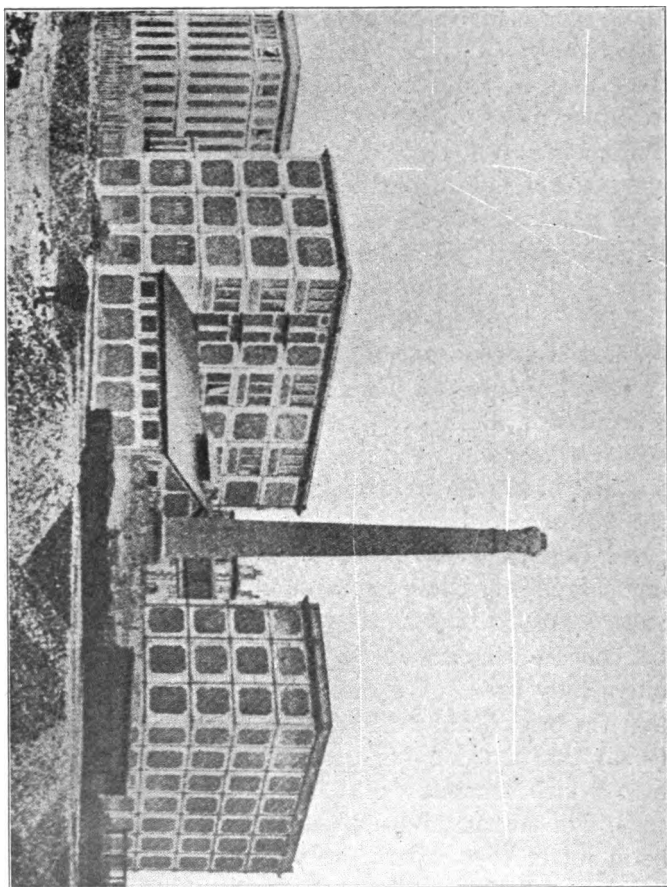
Flour-mill, Grain Elevator and Smoke Stack in Brest, France. The entire group of buildings is of concrete construction.
